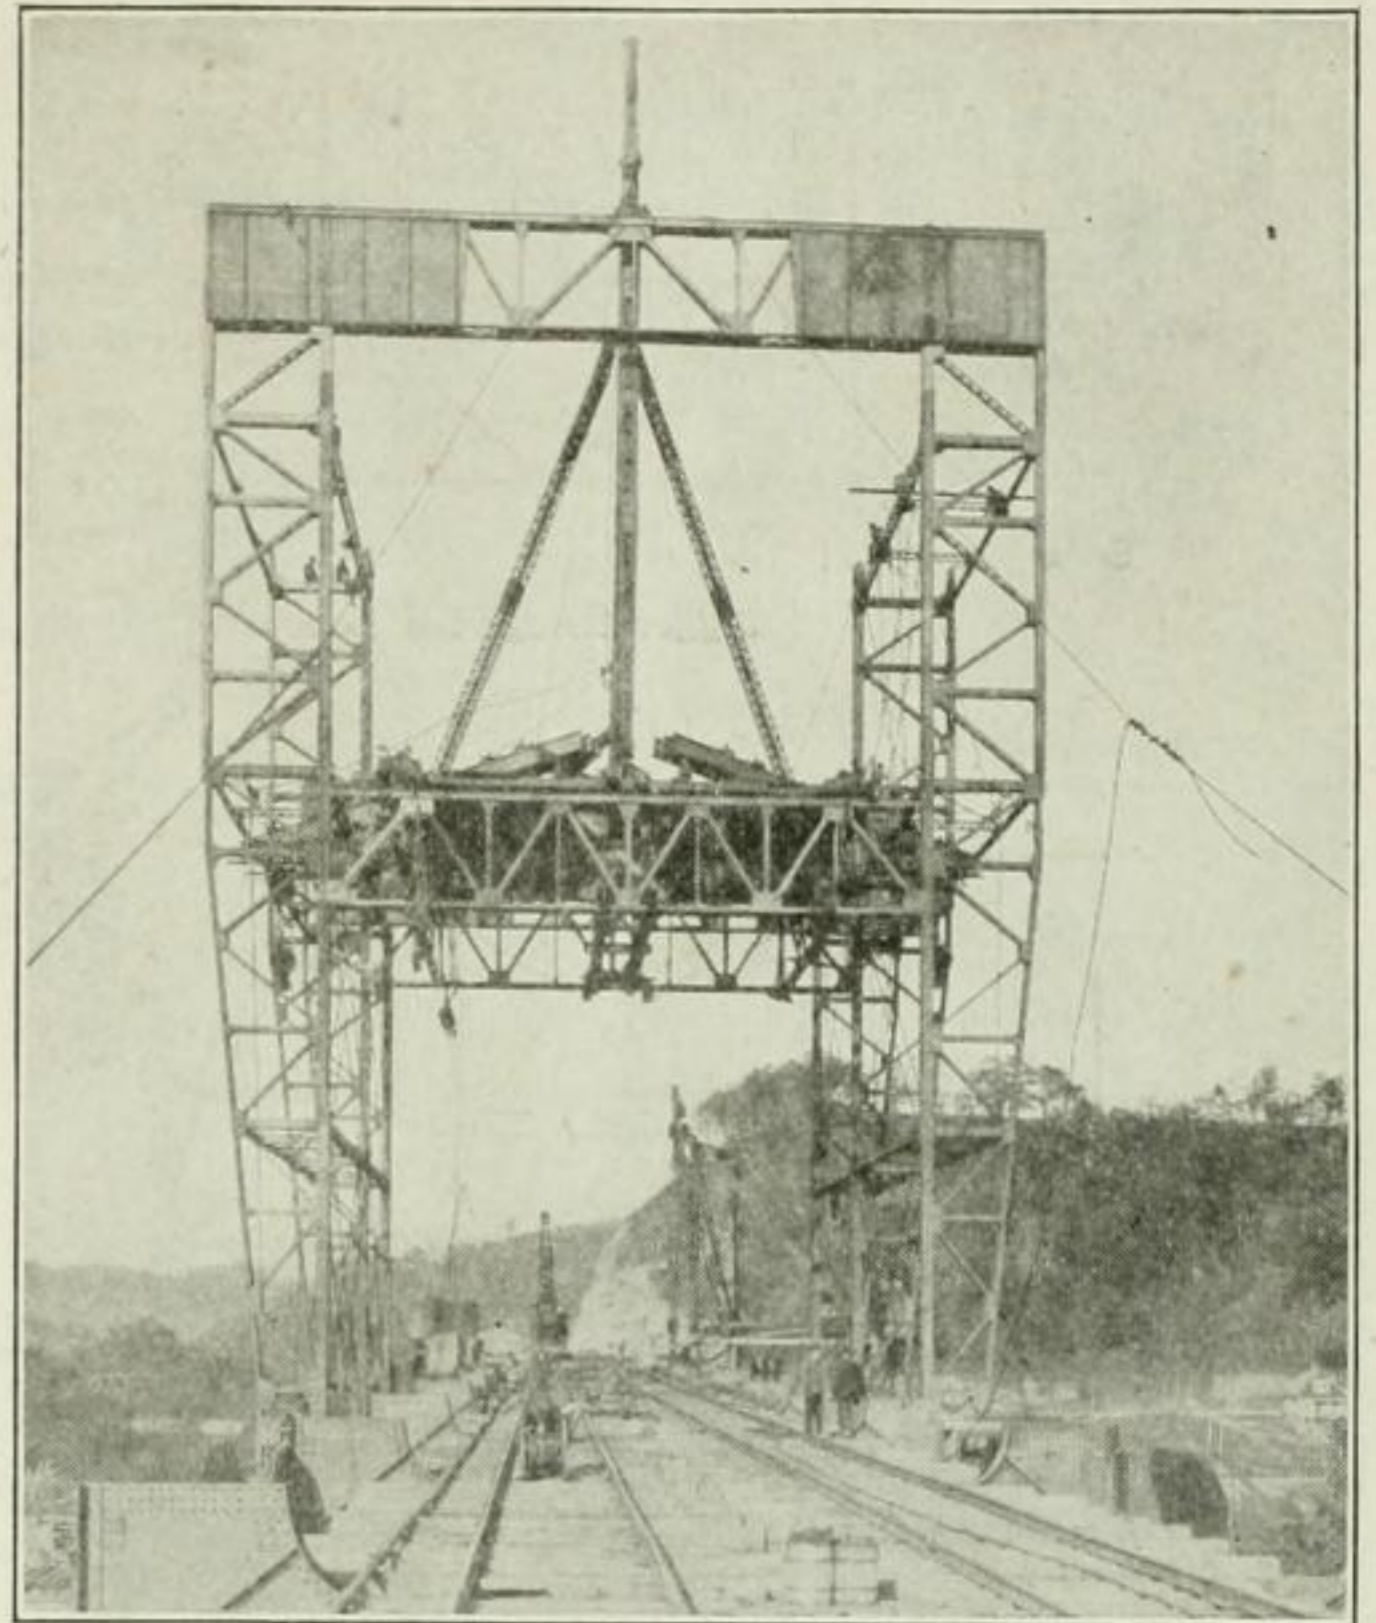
STIFF-LEG DERRICK ON TEMPORARY FLOOR RAISING GANTRY TO FULL HEIGHT
